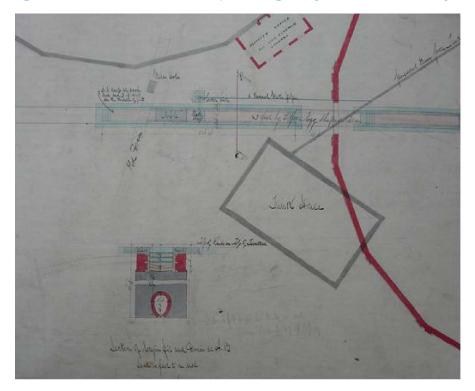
Cross-section of external inspection pit and culvert, as designed (NA RAIL 527.2368)
